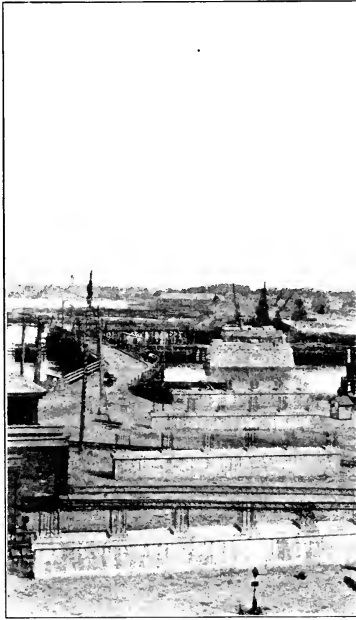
VIEW FROM BRACKETT STREET SHOWING PIERS AND TEMPORARY BRIDGE.
